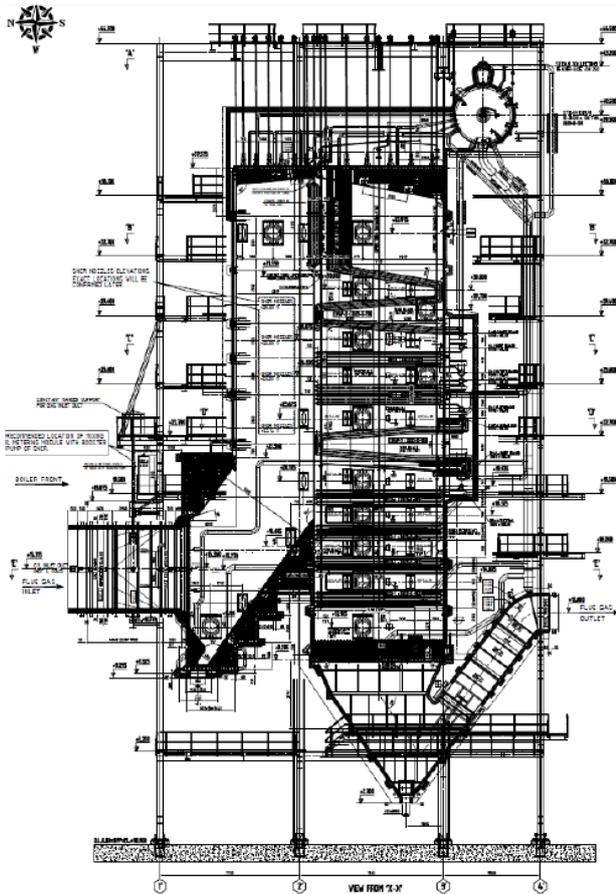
Waste Heat Boiler (Typical Arrangement)
